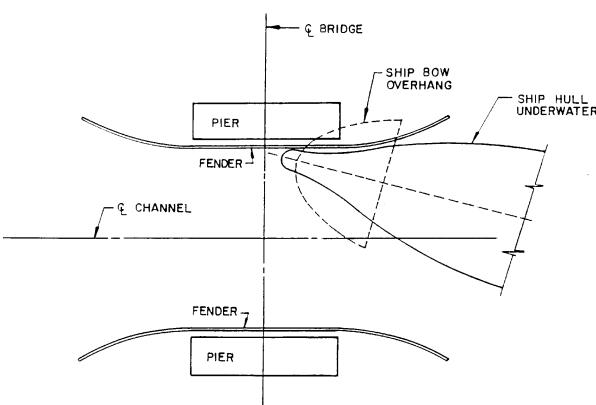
Plan of Ship Bow Overhang Impacting Pier
